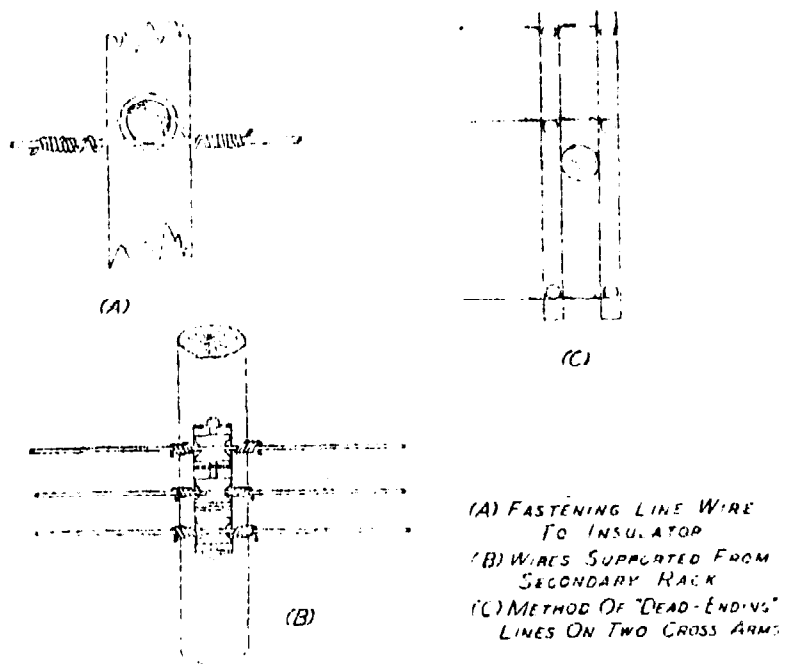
DETAILS OF TRANSMISSION LINE CONSTRUCTION
